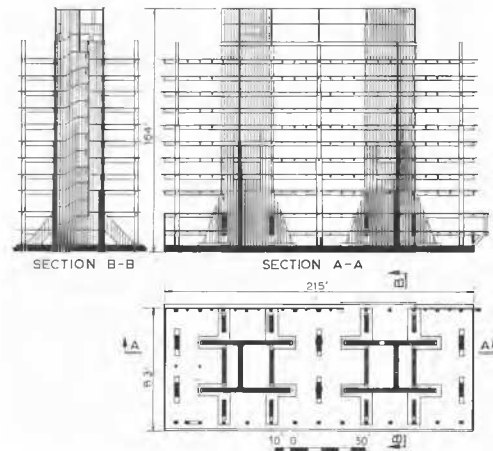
Departmental Office Building, Bowen St., Wellington.
